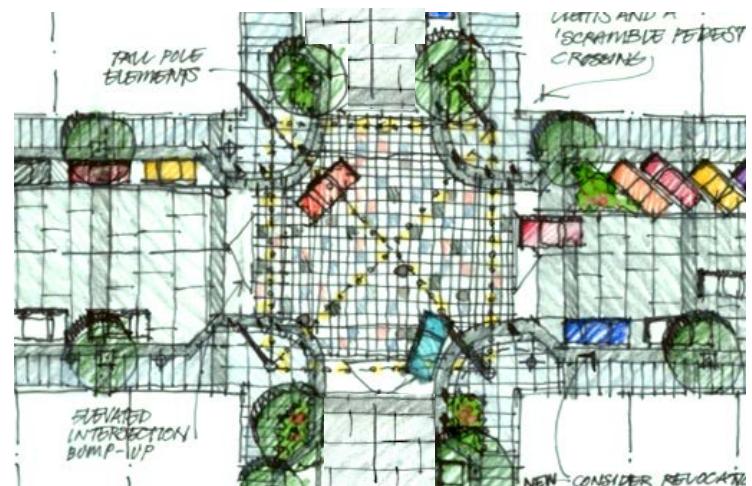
The raised intersection and crosswalks at the Ward and Baker Streets intersection with bulb-outs, a scramble intersection, trees and plantings, and catenary lighting
